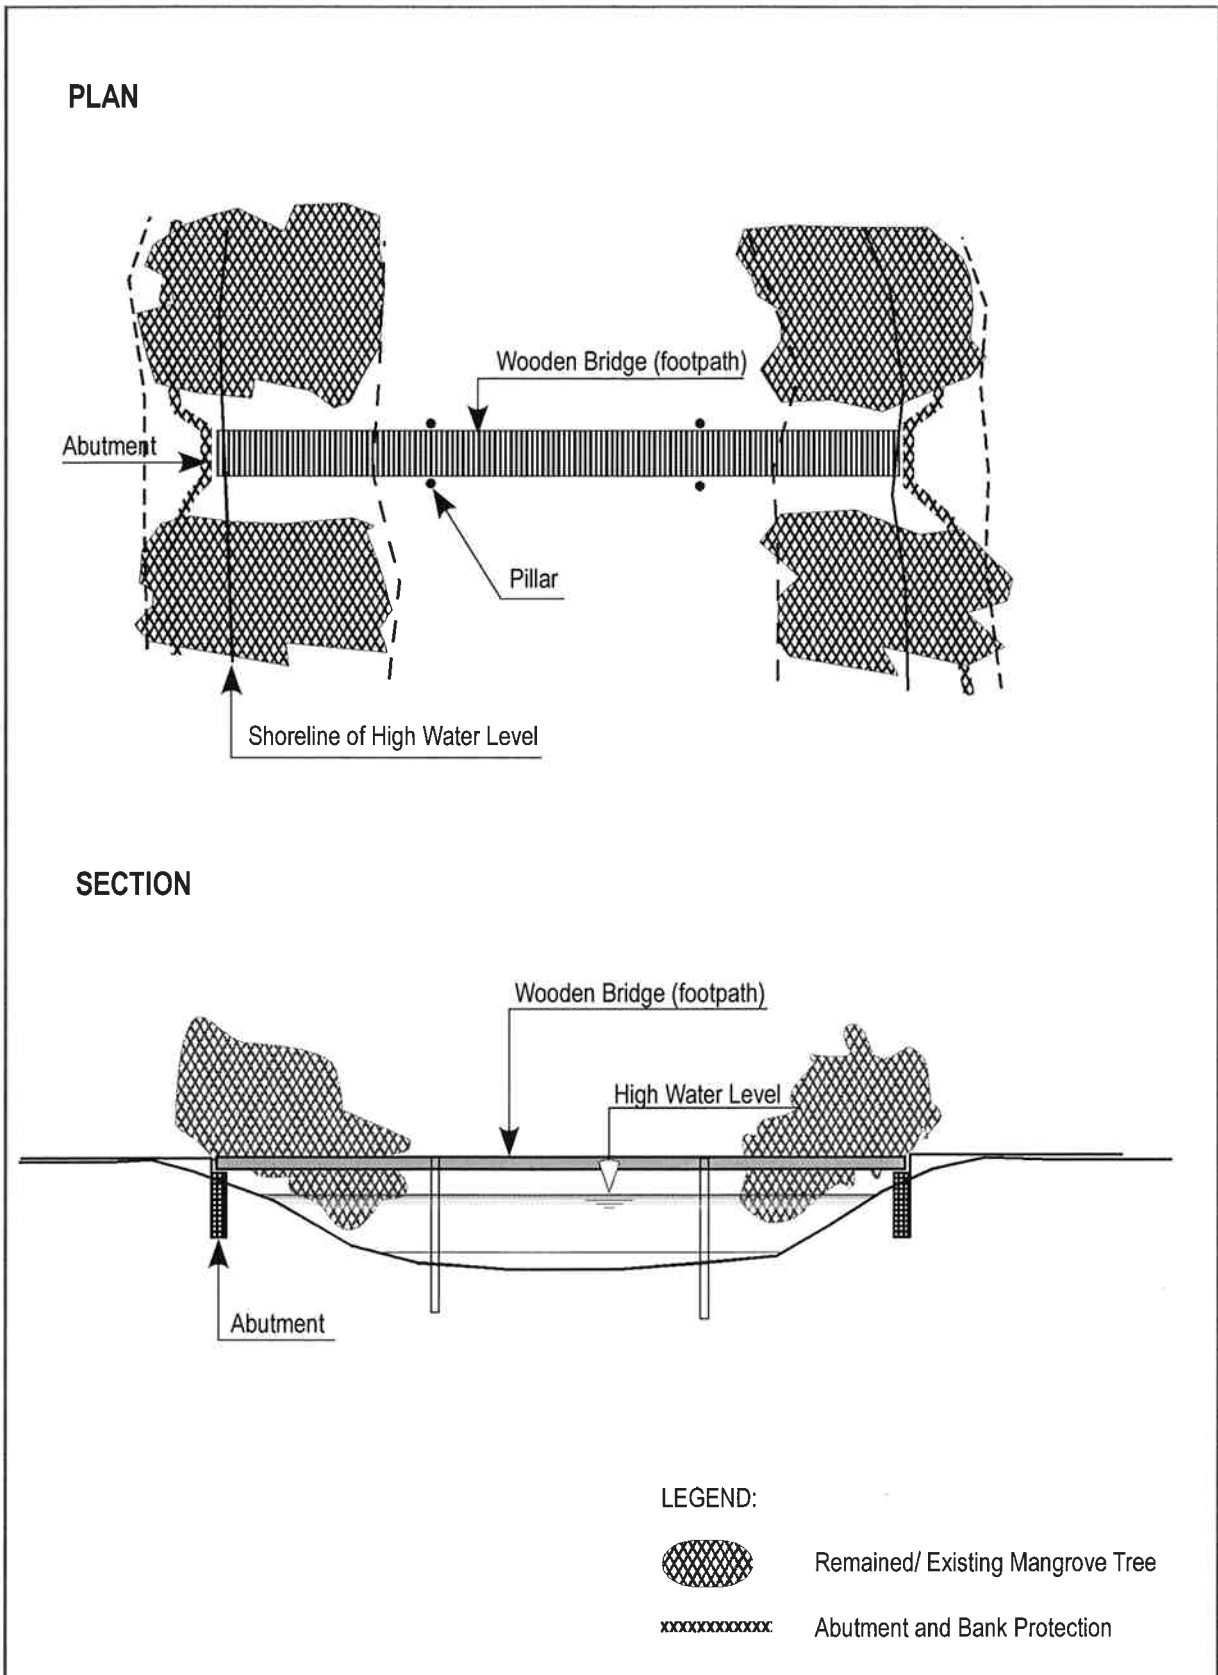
The Proposed Pedestrian Bridge at Khawr Shinas & Harmul/Nabr
